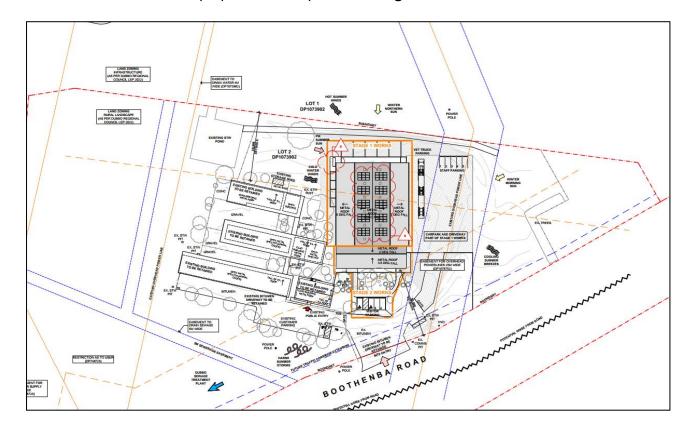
Submitted Site Plan with both Stages 1 and 2 outlined.
